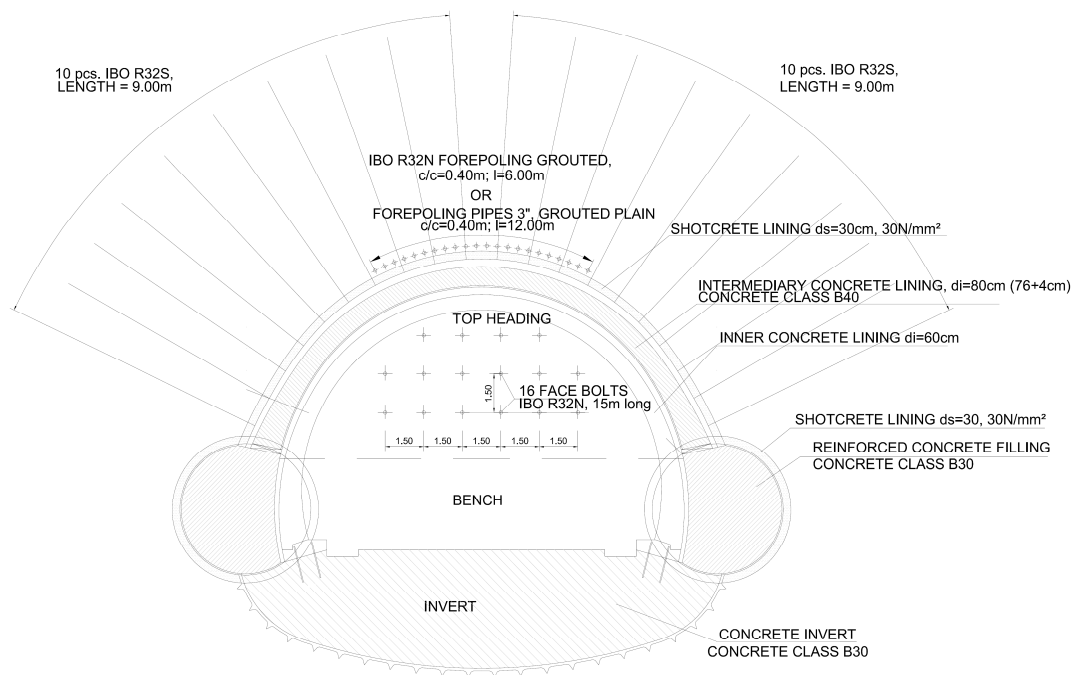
Bench pilot tunnel method implemented at major fault zones [50].
